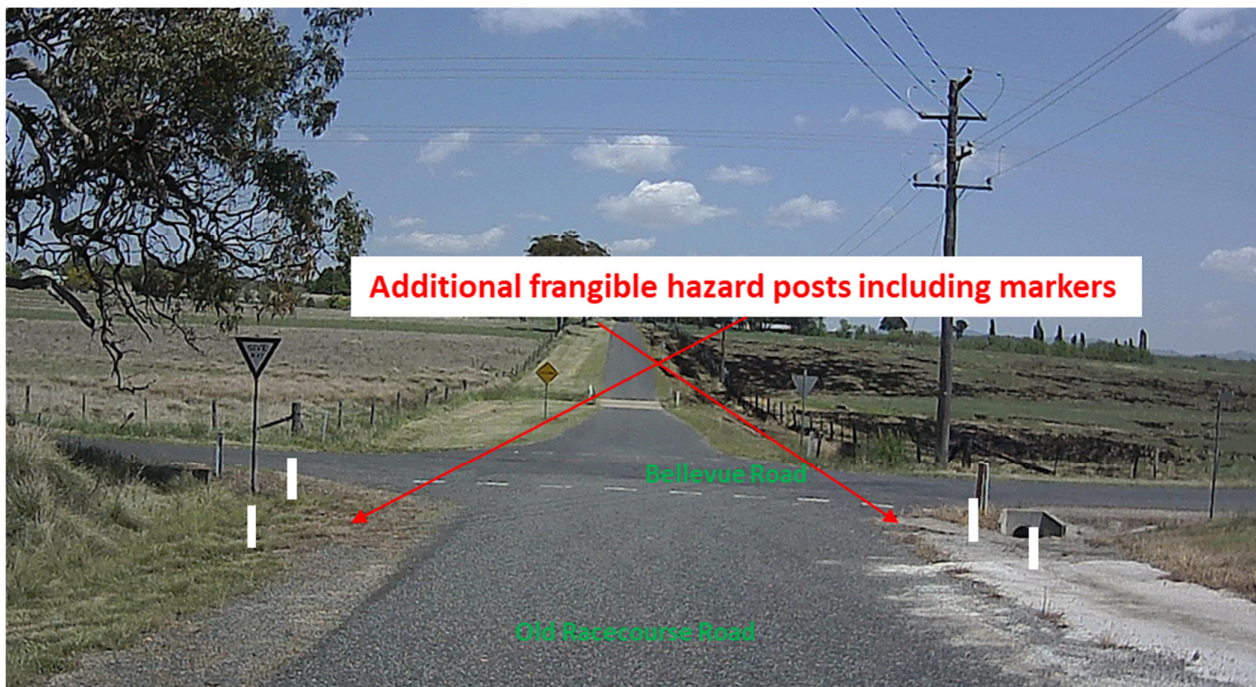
Intersection of Old Racecourse Road and Bellevue Road (facing west)
